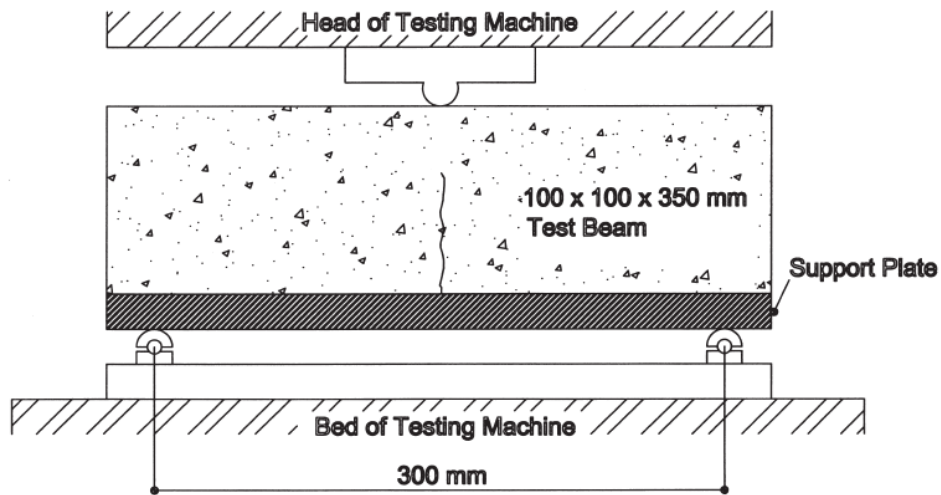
ASTM C 1399 Pre-Cracking Test Set-up [16]
